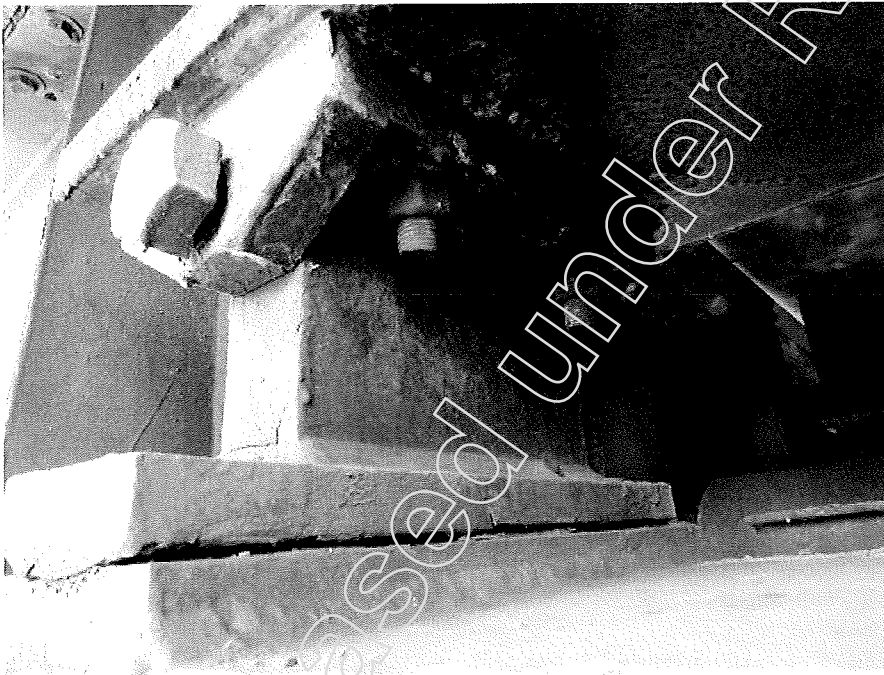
View of the Span 2 expansion hinge (dishing of sole plate ?)
